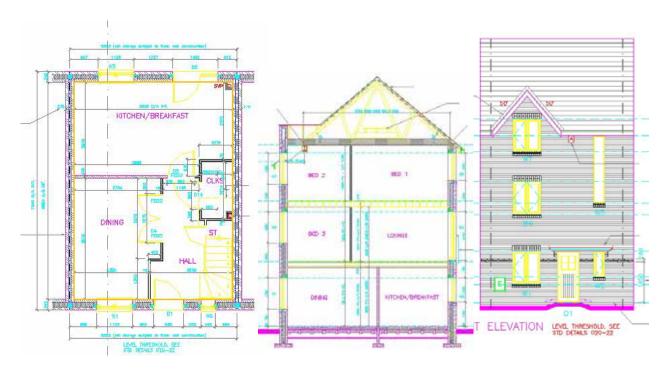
Plan, Elevation and Section Drawings for Redrow "Wye" House Type (Plot 402)
